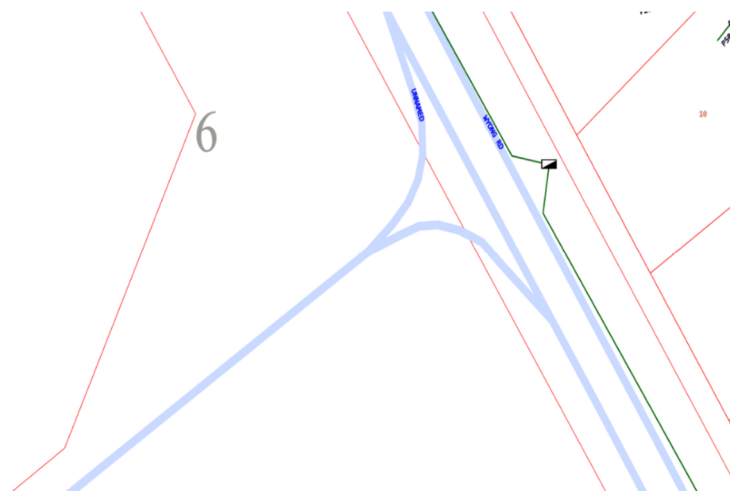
NBN Plan from DYBD (No NBN connection to site from Wyong Road)
